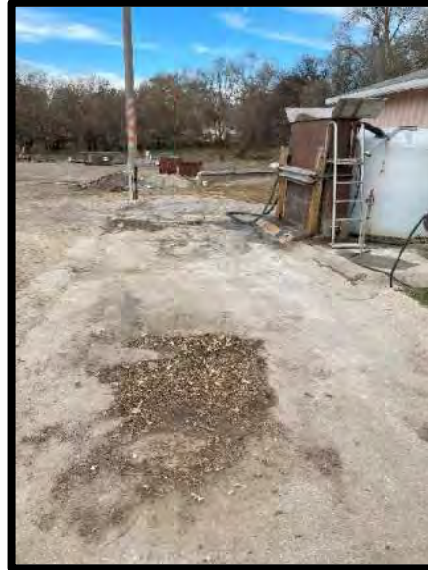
Flared End Section West of Salt Storage Building – 11/14/2023
